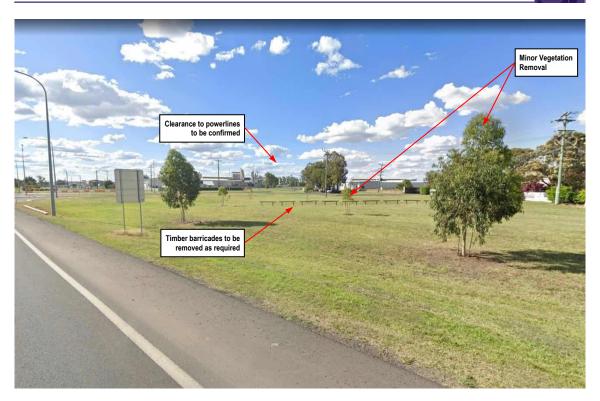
Warrego Highway / Jandowae Road Intersection (Location 9 - Option A) Looking North
